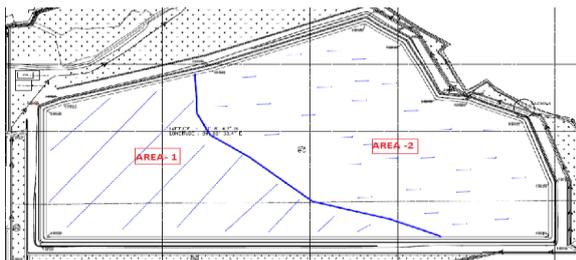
Plan showing demarcation of Area1 and Area 2 for raisings of ash pond
